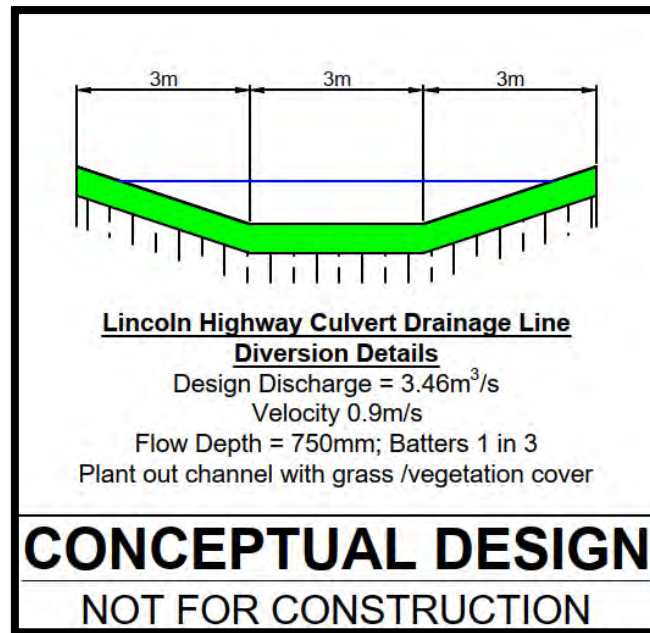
Conceptual design Lincoln Highway culvert drainage diversion details.
